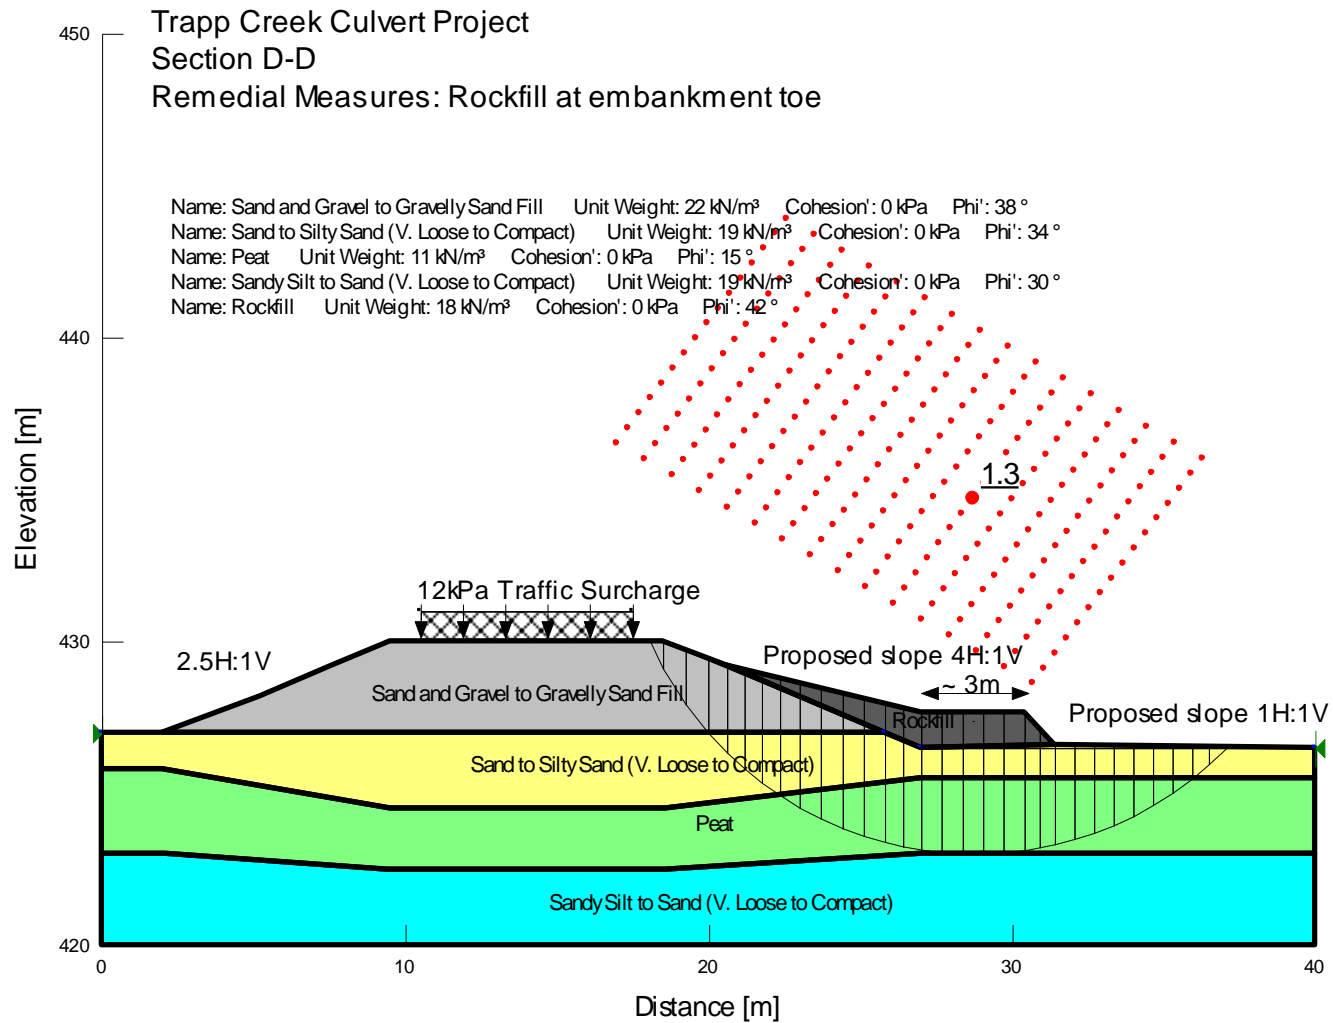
Results of slope stability analyses at Section D-D; Remedial measure – rockfill at embankment toe
